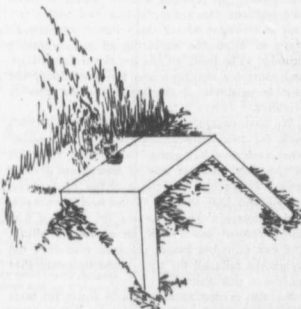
Tile Drain protected by Head and Wing Walls
